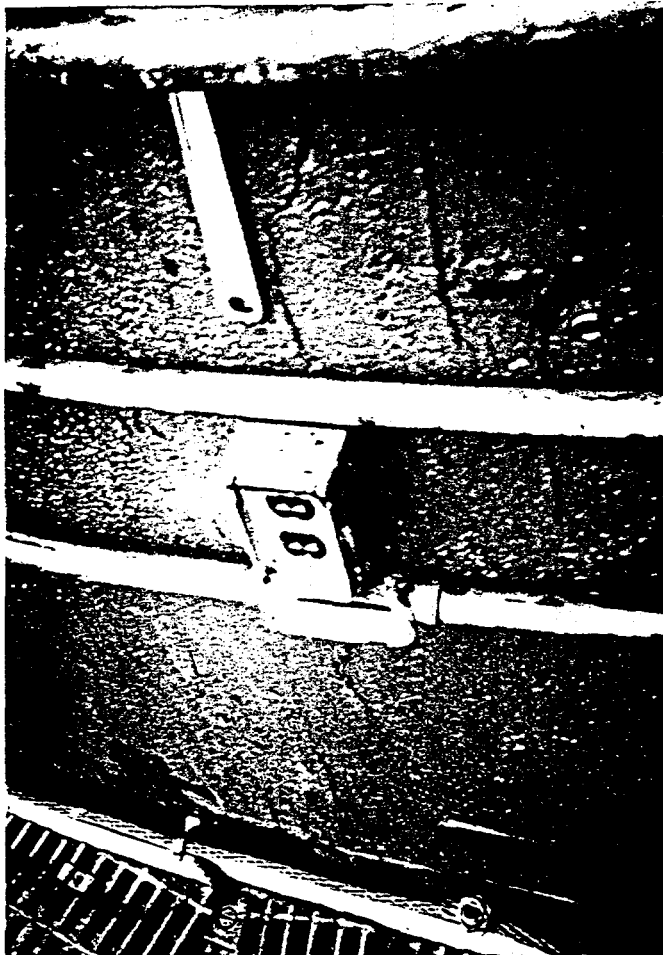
Electrical outlet at monitoring platform. Note no cover on box.
